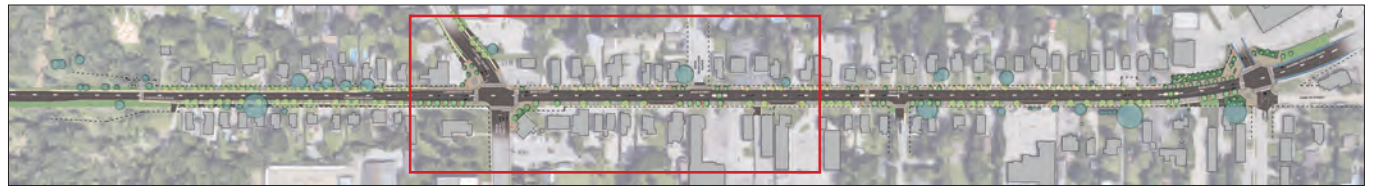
Main Street Facing East | Boulevard Section at 1+200
